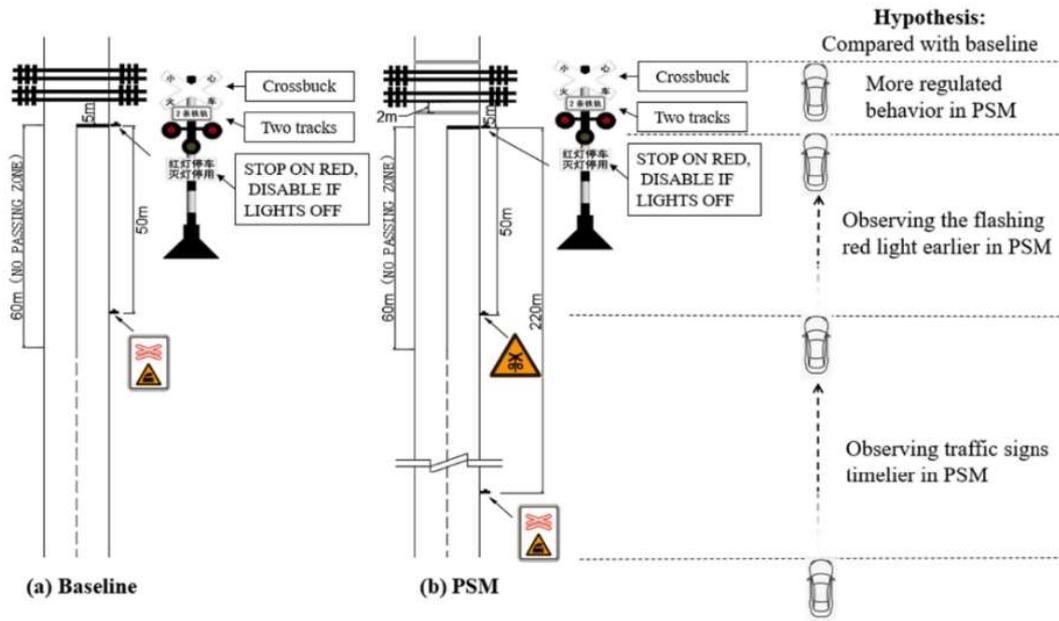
Representation of two flashing-light-controlled grade crossing scenarios. (a) Standard design of signs and pavement markings for grade crossing of China; (b) Proposed design of signs and pavement markings for grade crossing (PSM).
